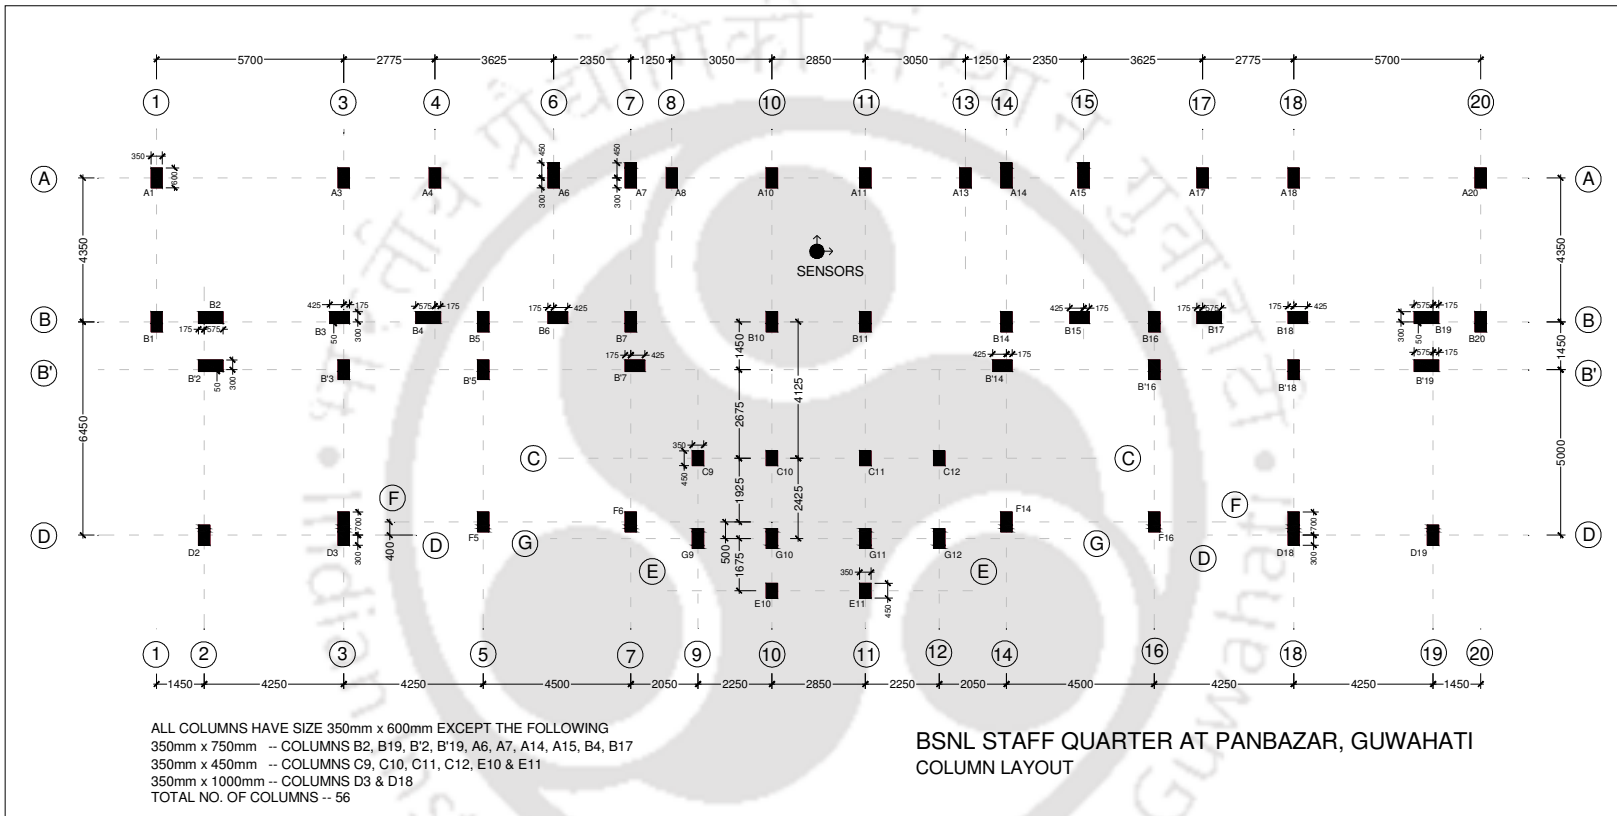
Plan showing column position and sensor location in the ground storey
